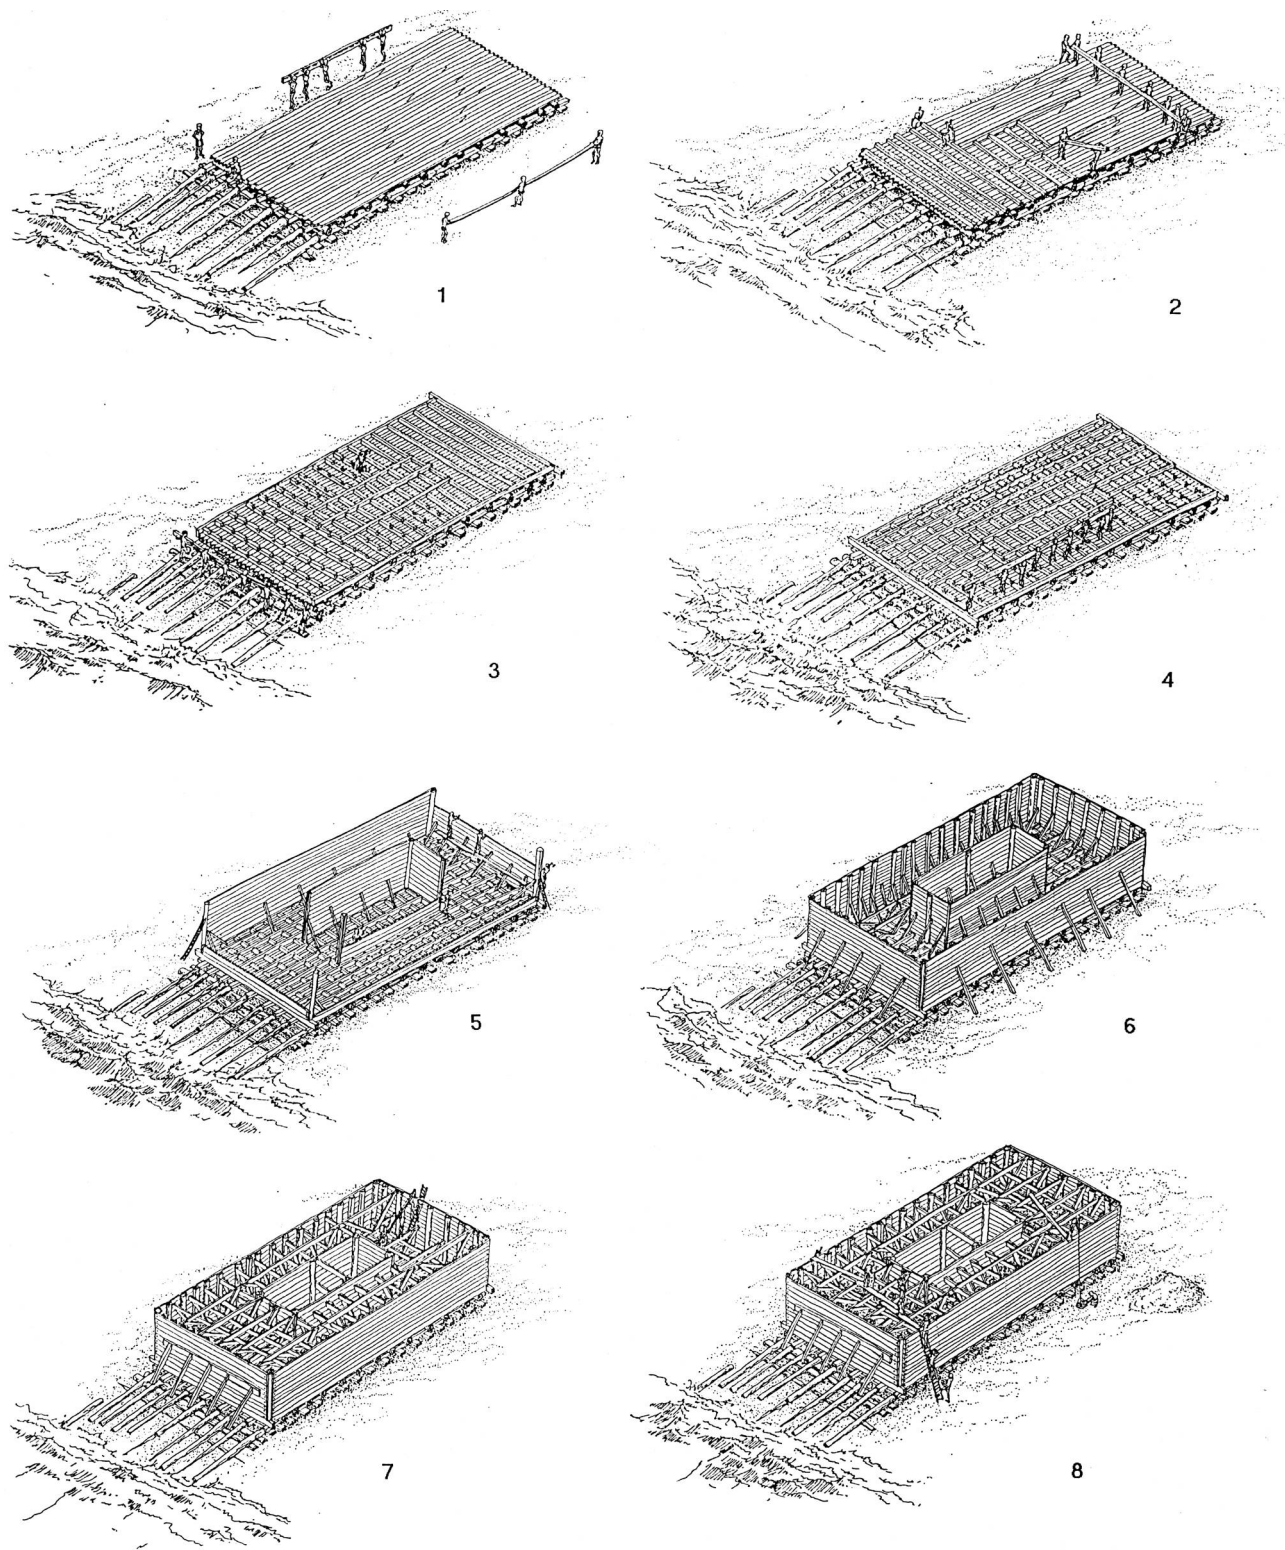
Artist rendering of the construction stages of a caisson and its placement in position on the sea floor (35.1-10)
